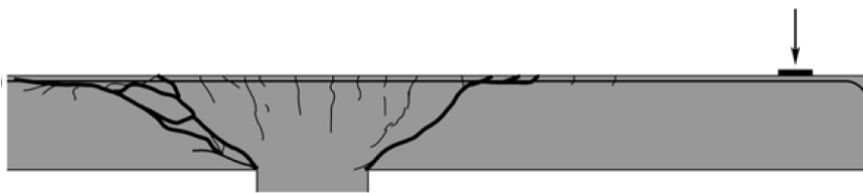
Cracking pattern of slab at punching shear failure at a slab-column support. (Muttoni, 2008)
